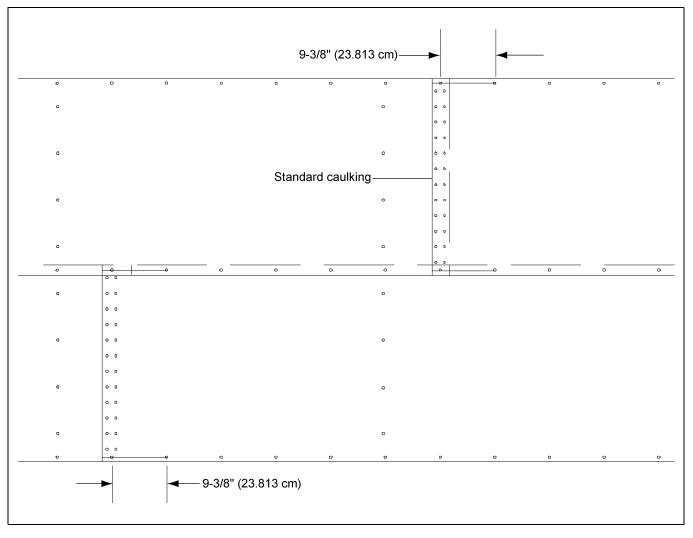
B Standard Sidewall Sheet as Viewed from Inside
